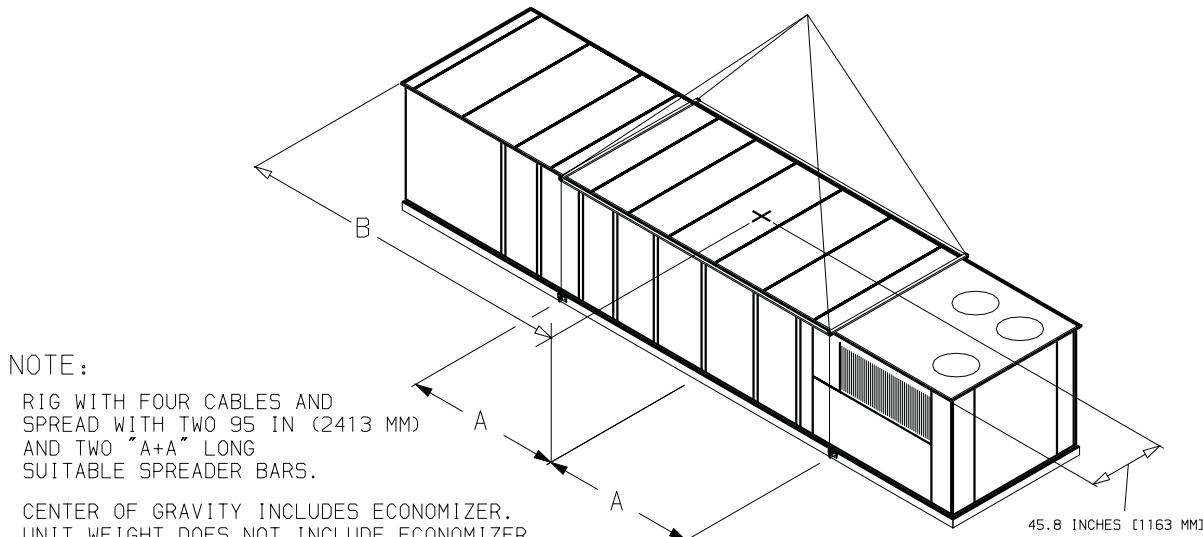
Rigging Label — Size 030-050 Units (Extended Chassis)
